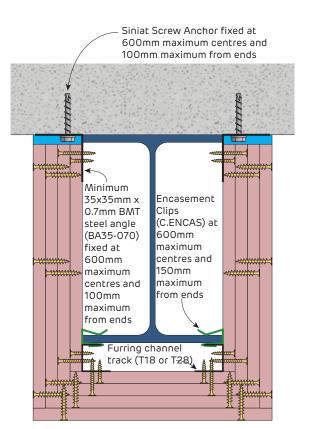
3 Sided Protection for I-Beam/Column Plan or Section
